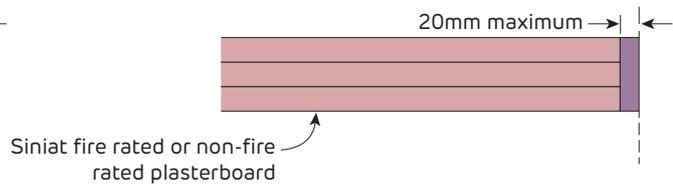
Finishing Detail - Bare finish with Sealant Section
